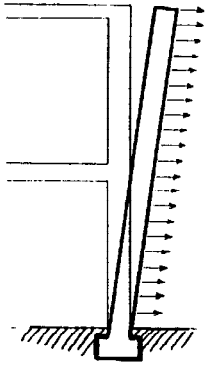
Collapse mode for out-of-plane inertia forces of an external bearing wall poorly connected at floor level.
